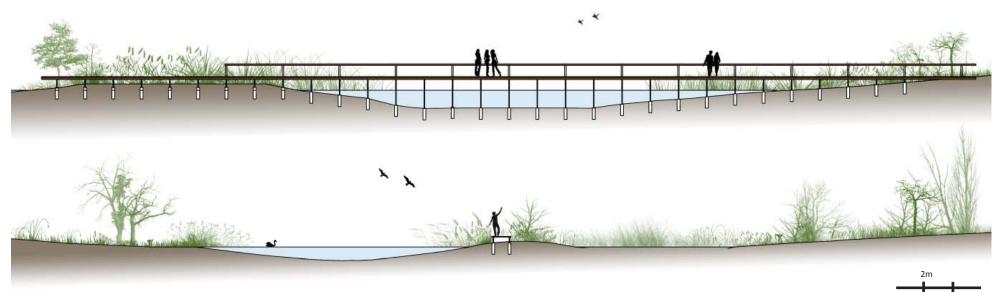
Sections A-A and B-B representing the structure of tontoons, footbridge and space around them.
